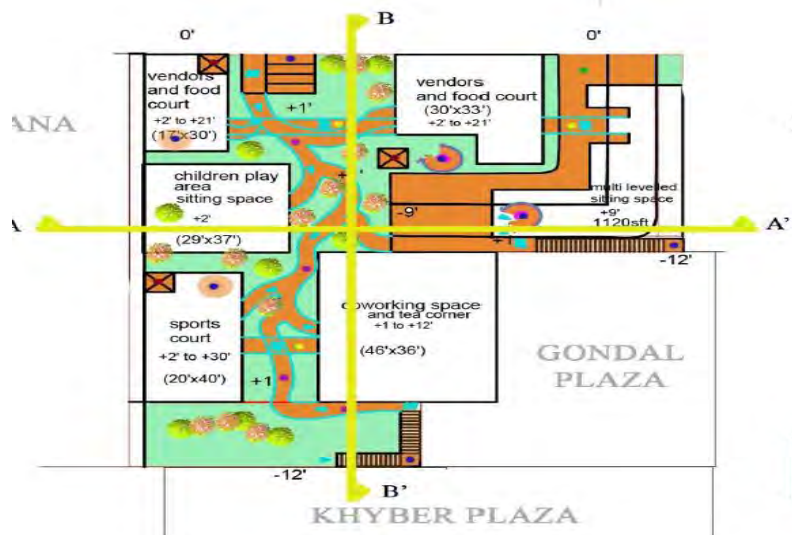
Proposal 03– Master plan (Source: Student group work.)
